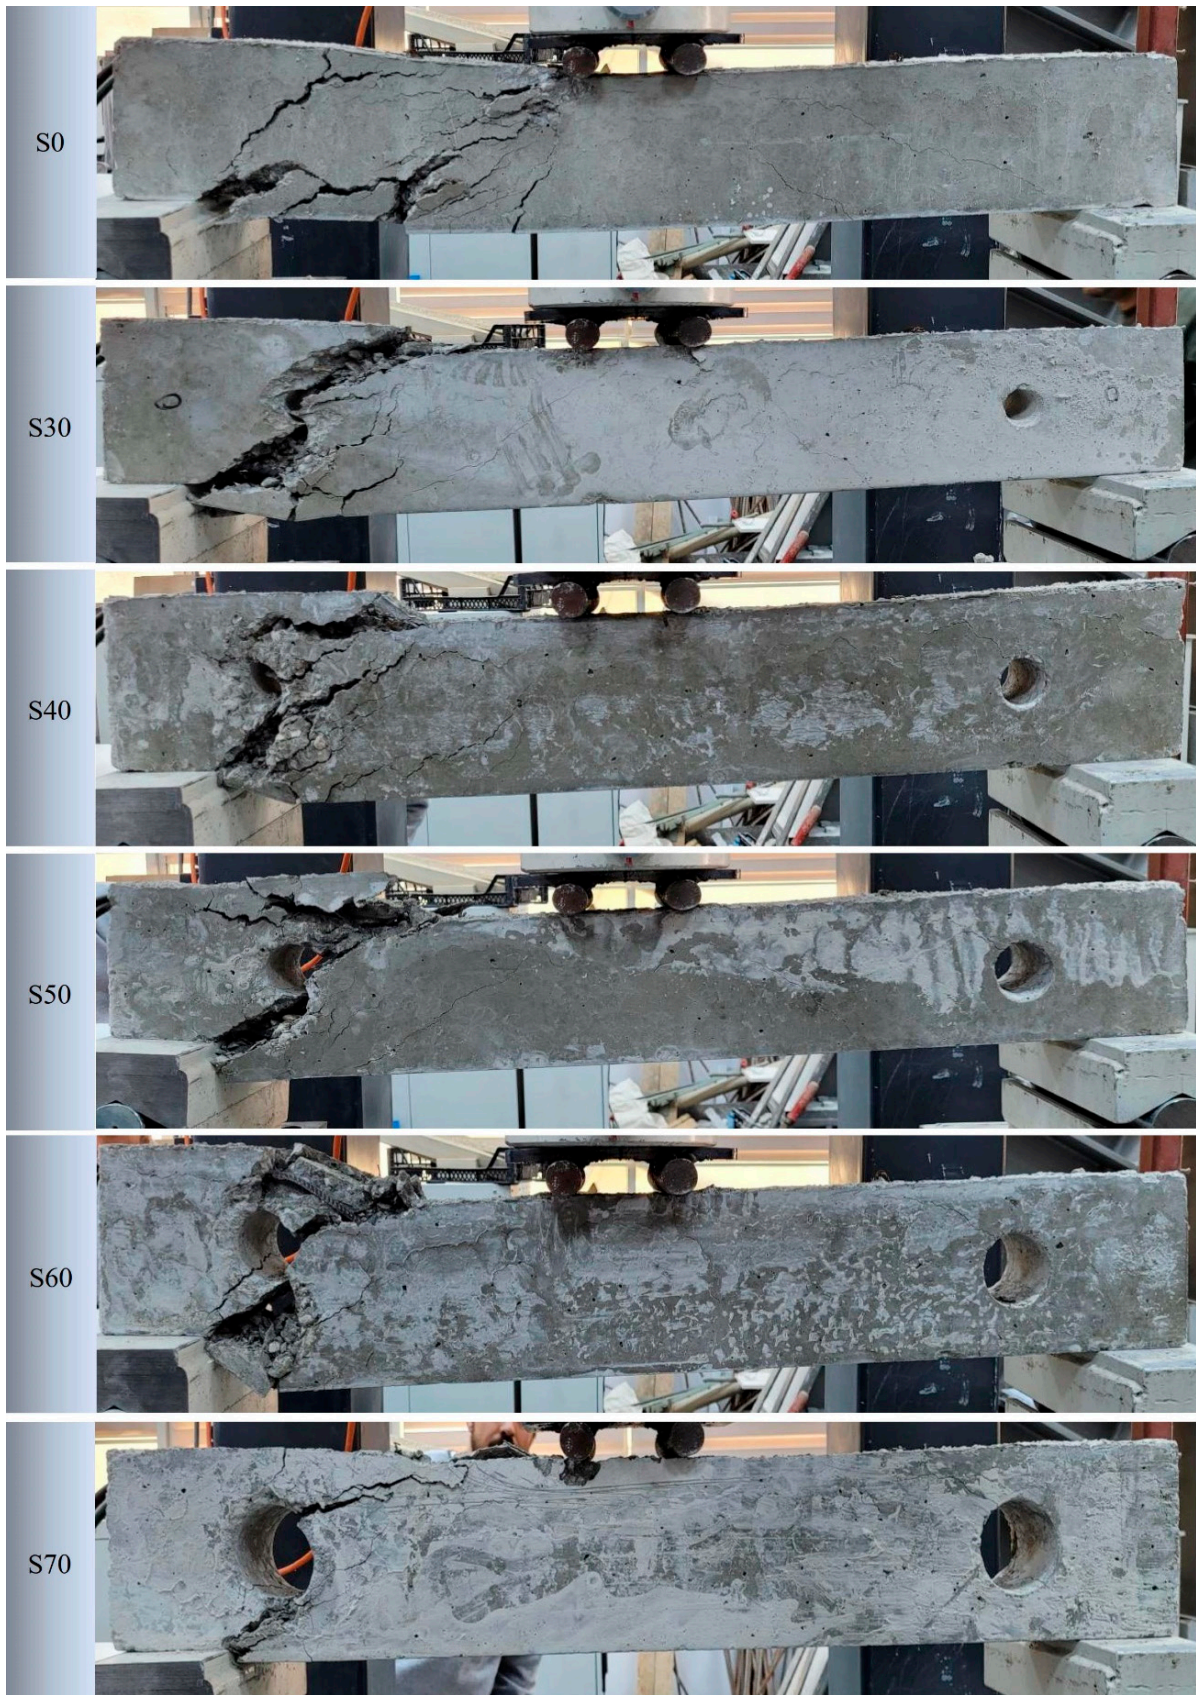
Failure modes of the beams with widely spaced stirrups (160 mm).
